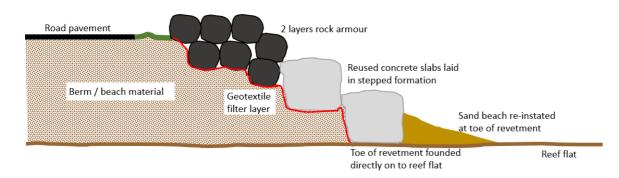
Cross-section of the proposed reconstructed revetment at Mosral. Source: Project Proposal Document
